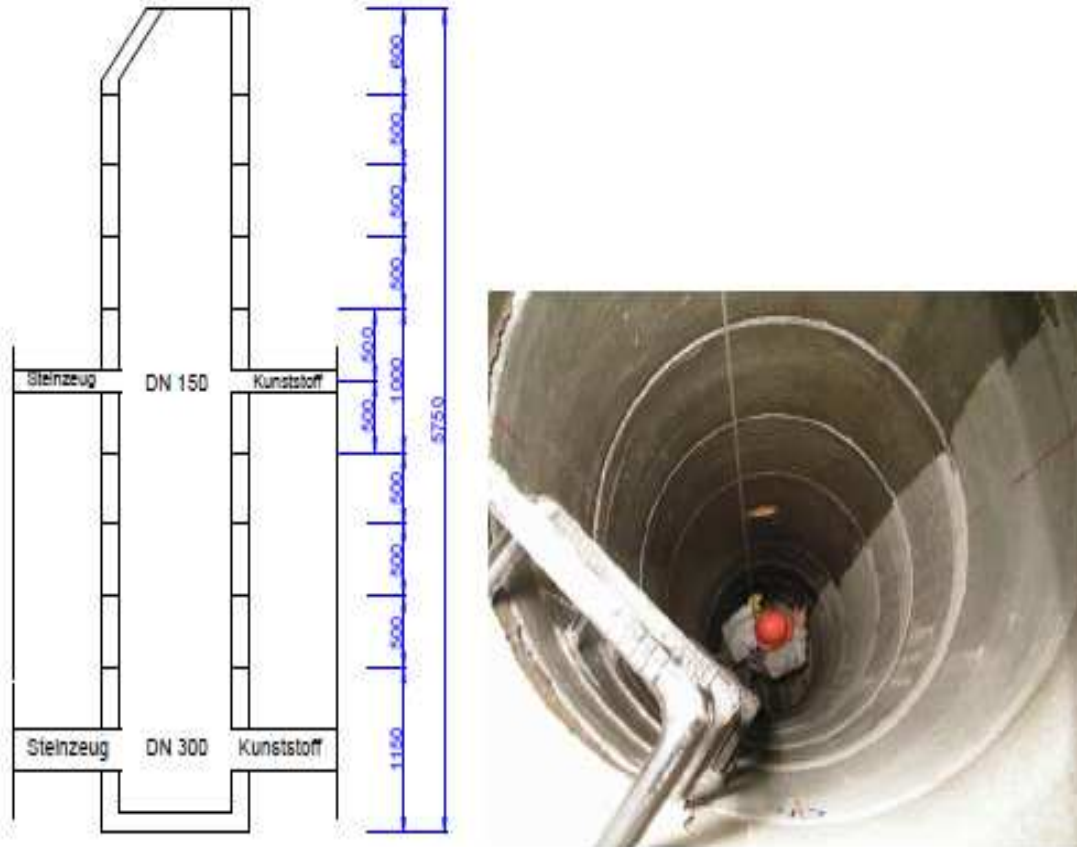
Shaft construction in large-scale test stand - section (left), look at a completed well (right)
